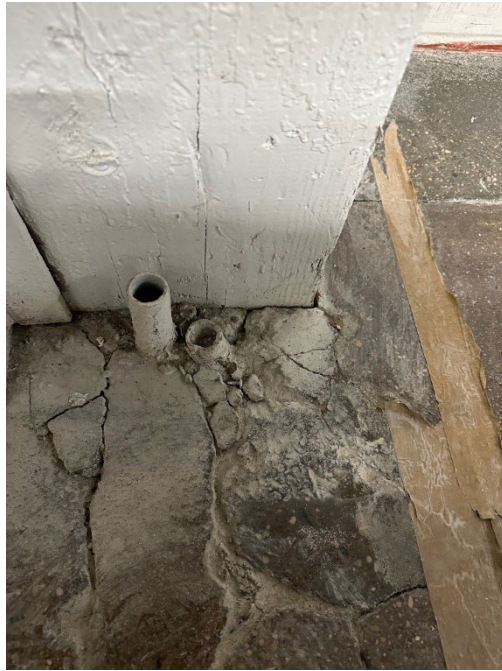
Metal pipes sticking out of the ground and cracks in the slab
